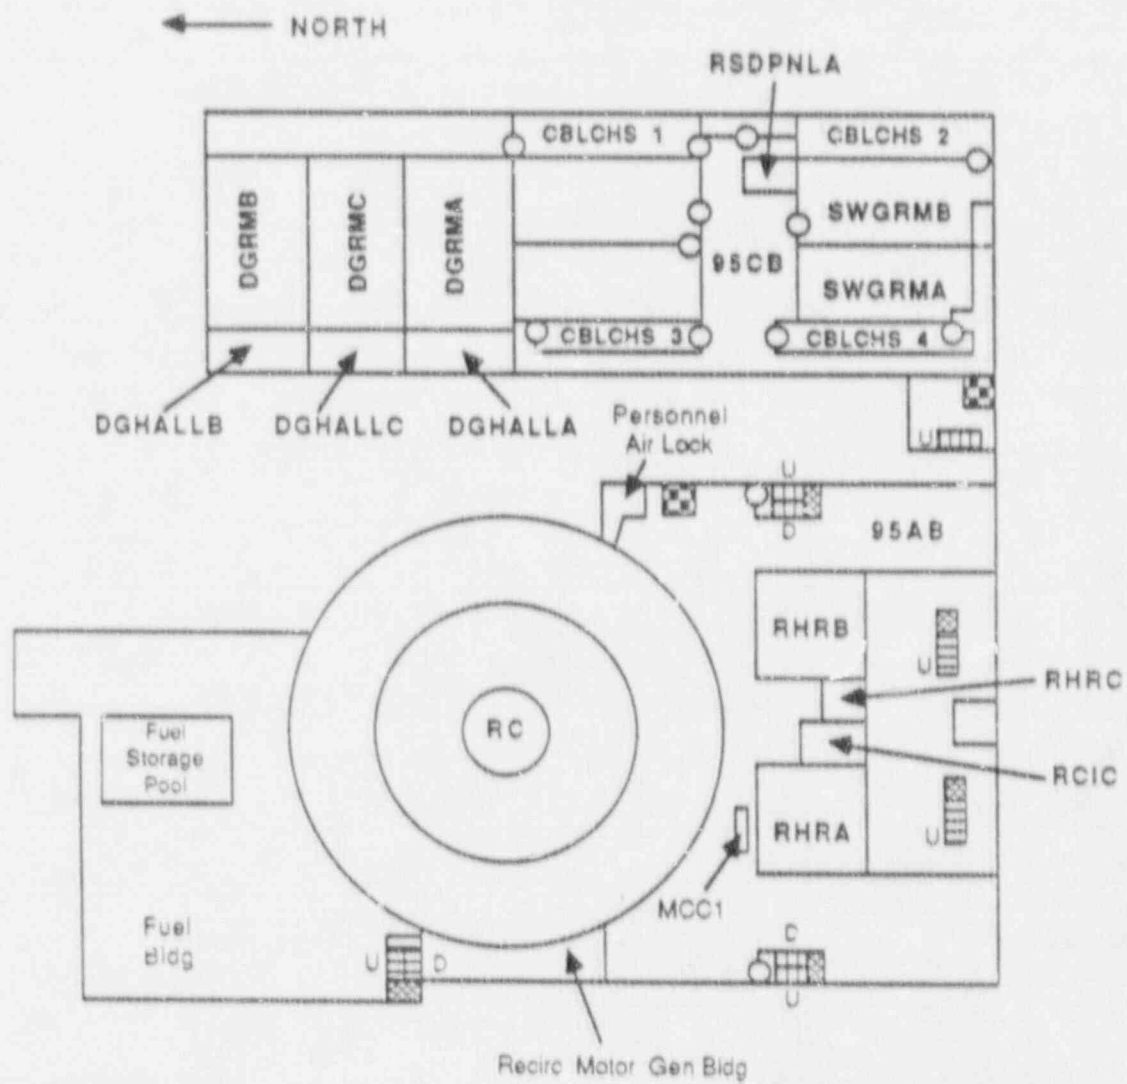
River Bend 1 Station Arrangement, Elevation 95'
